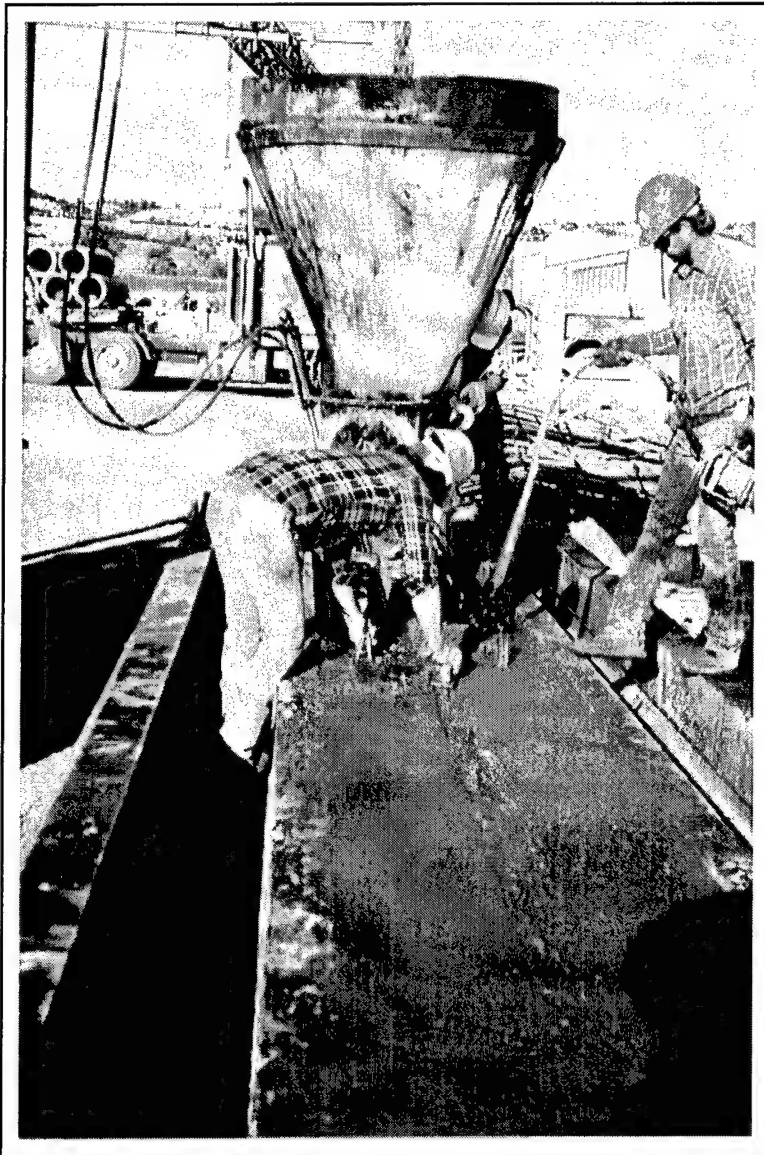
Conventional needle vibrators used to consolidate the concrete.
